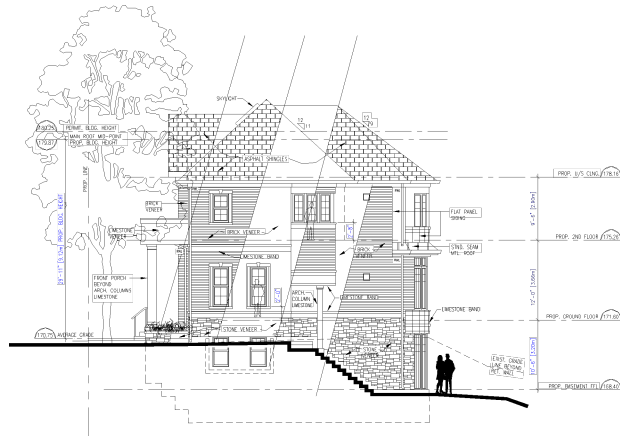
East Elevation for proposed new dwelling. This elevation will be minimally visible from the public realm.
